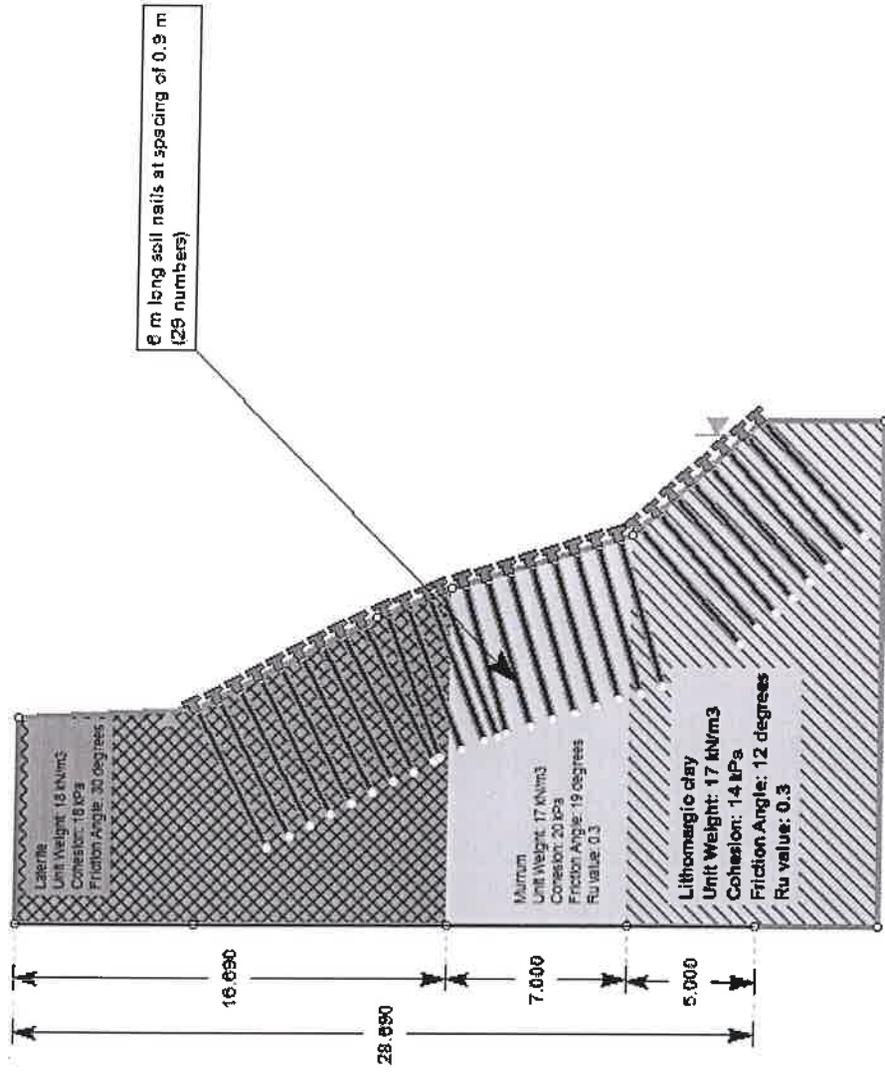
Cross-section of slope at 190.640 with remedial measure, providing 29 numbers of soil nails of 6 m length at spacing of 0.9m
